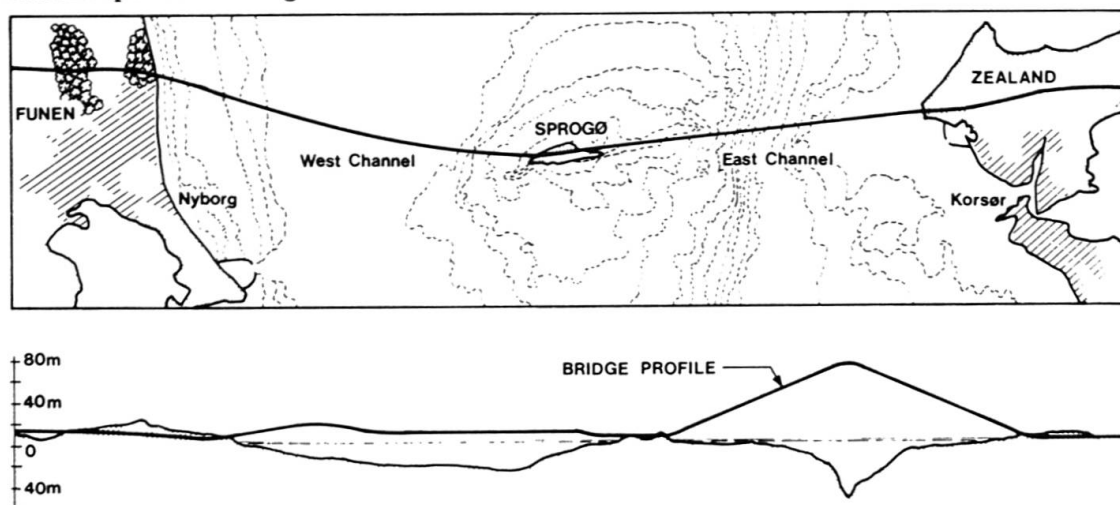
Alignment and longitudinal profile of the planned Great Belt Bridge.
